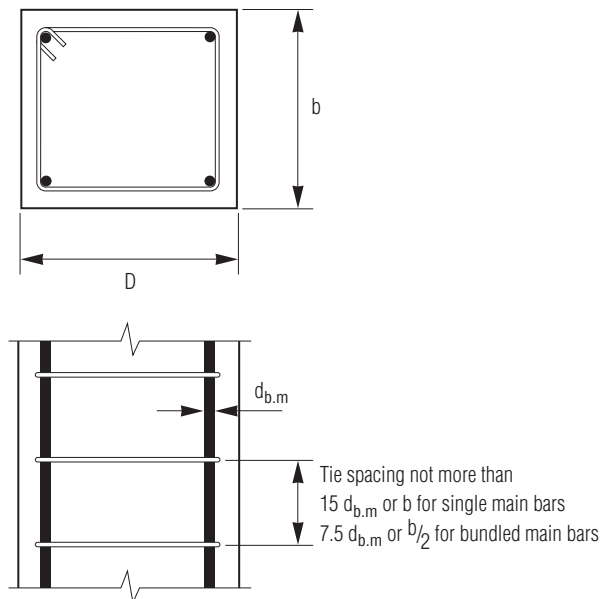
Requirements for Lateral Restraint of Longitudinal Reinforcement
